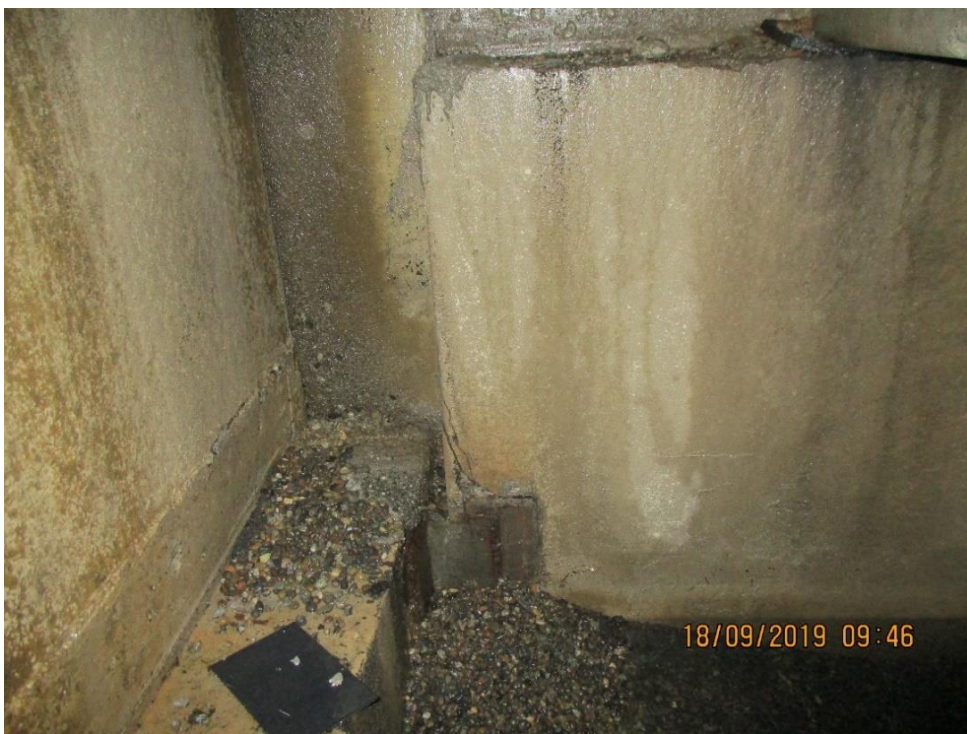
Minor spalling around steel connectors at grade beam corner connection
